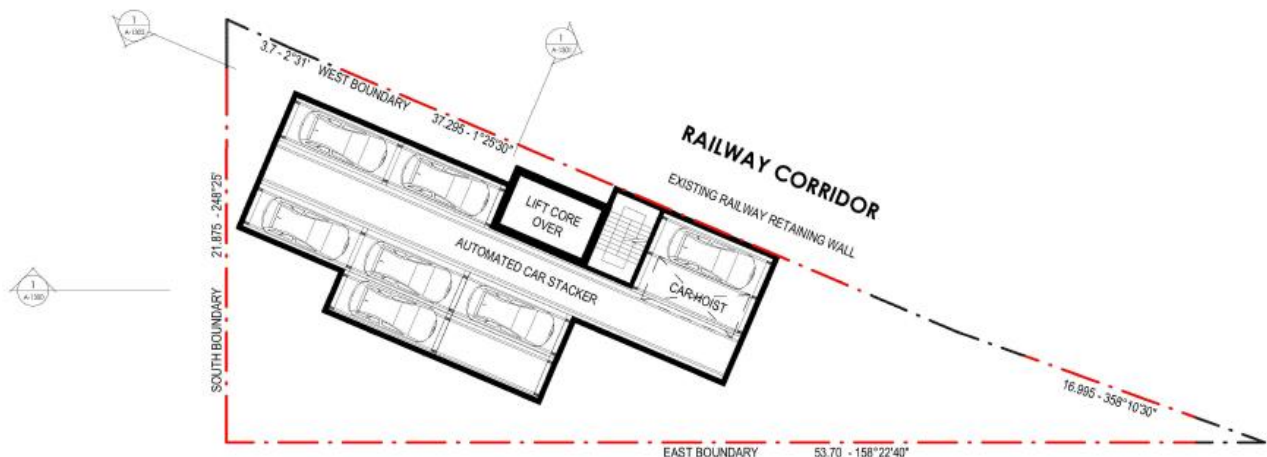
Proposed underground floor plan with car stacker (source: Drew Dickson Architects)
